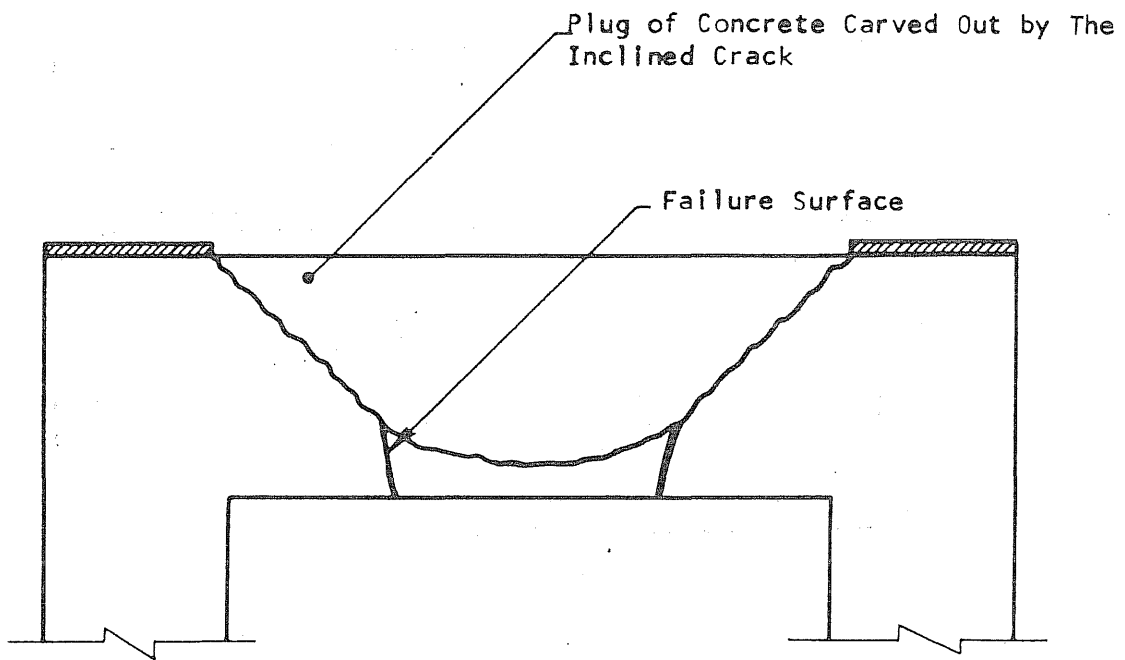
CRYPTODOME SHAPED BY THE INCLINED CRACK AND THE FAILURE SURFACE
